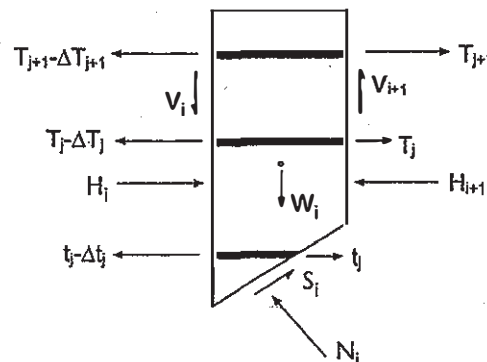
Forces developed on a single vertical slice containing reinforcement
